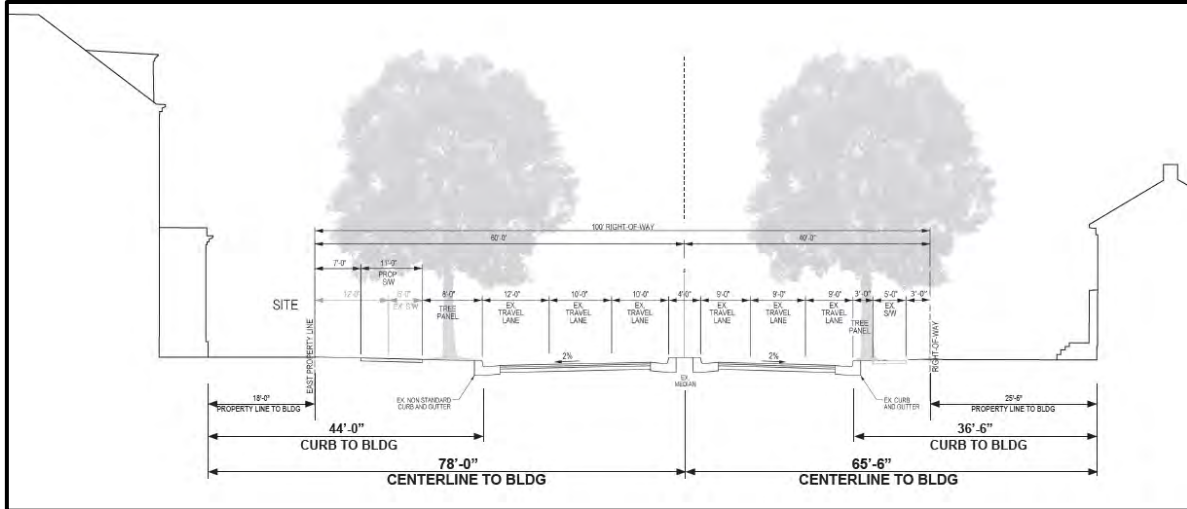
Cross Section of Connecticut Avenue looking north, with Subject Site on the left
